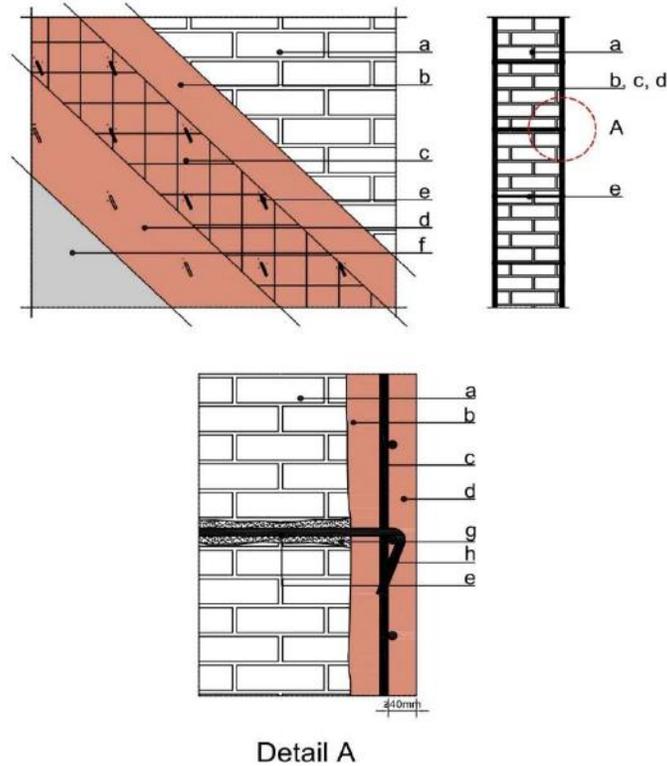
RC jacketing details: a) existing masonry wall; b) first layer of concrete jacketing; c) welded steel wire mesh; d) second layer of concrete jacketing; e) cross-connection steel anchors; f) plaster; g) hole in the masonry wall filled with epoxy resin or cement mortar grout, and h) steel anchor with a 90° degree hook (Source: ALL Ingegneria and AIRES Ingegneria).
